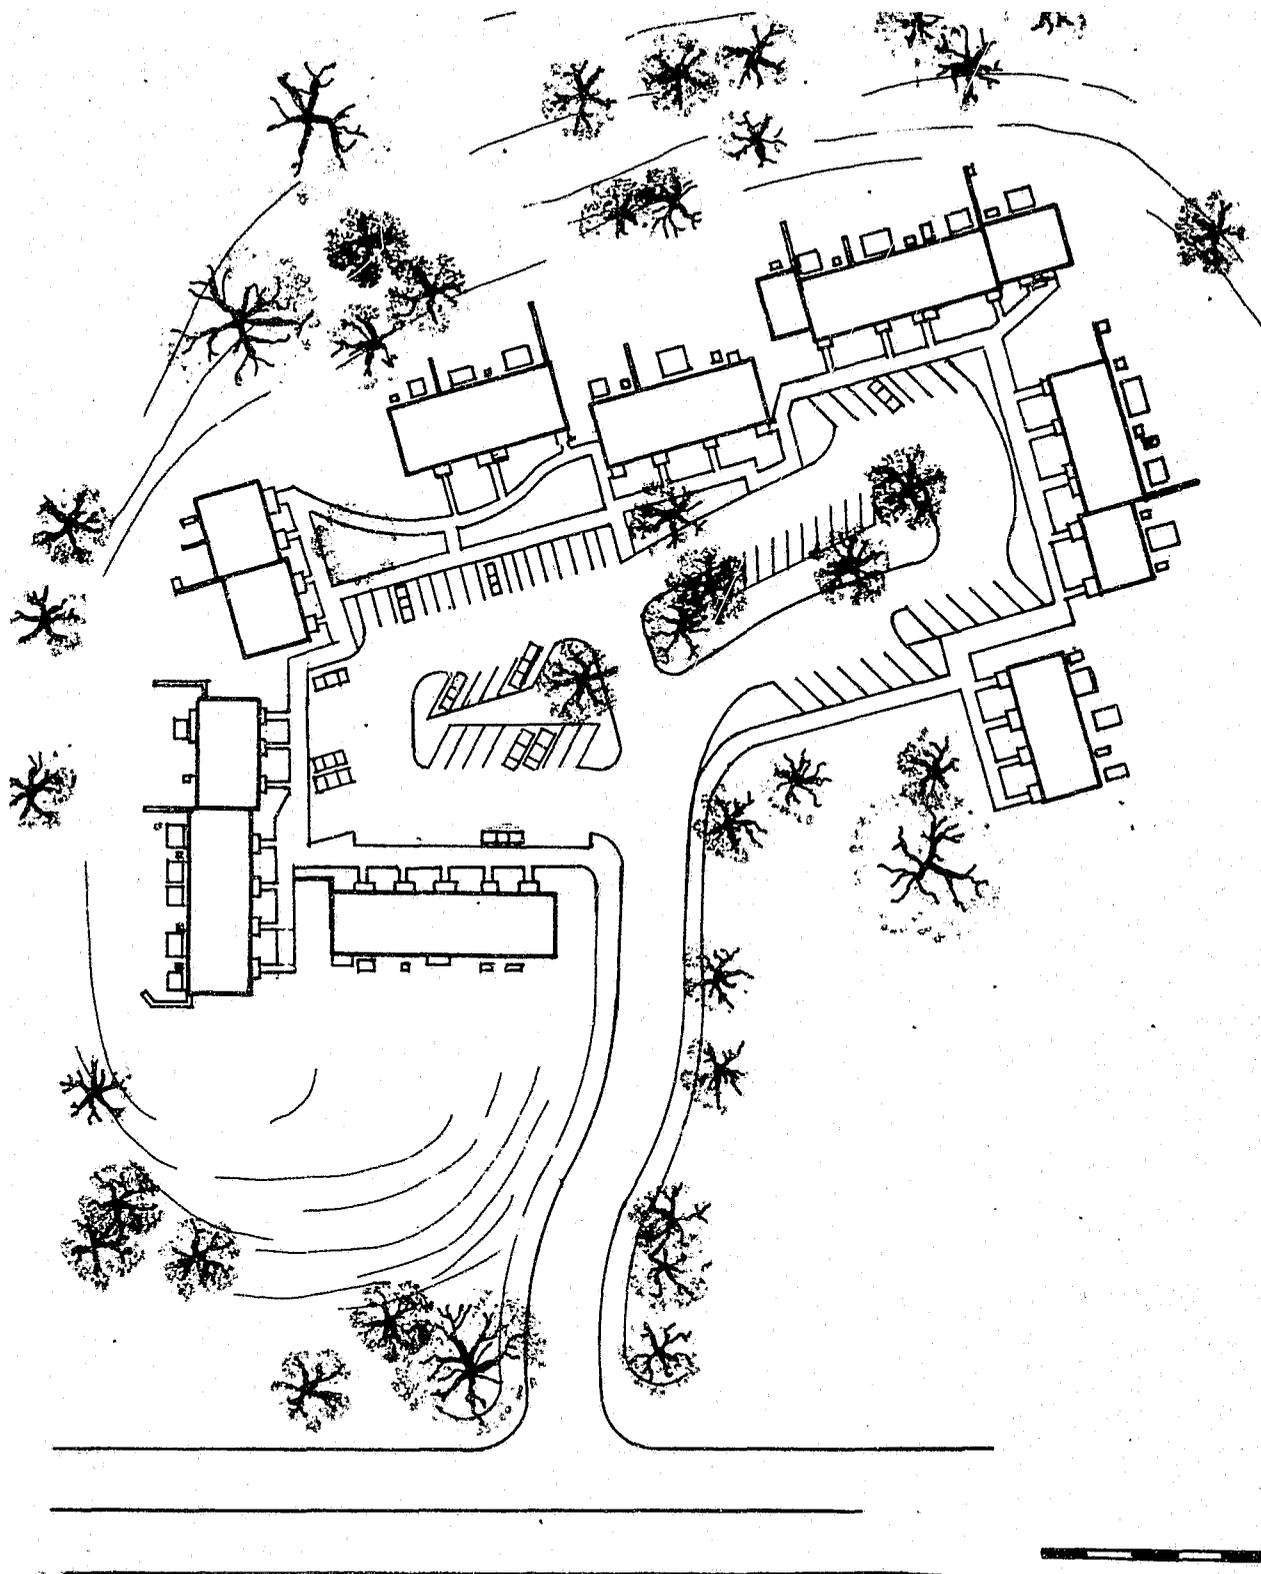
Tower Hill, St. Louis County. Site plan.
